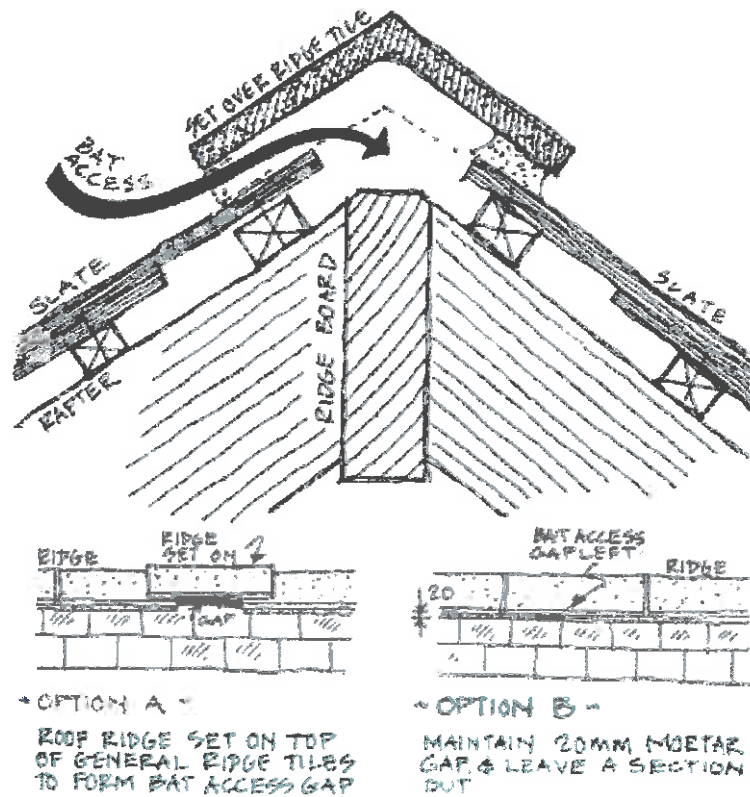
Gaps will be left to enable bat access under some of the ridge tiles. This can be achieved through one of two options (A or B). Access into the new roost spaces will be provided on one side only.
